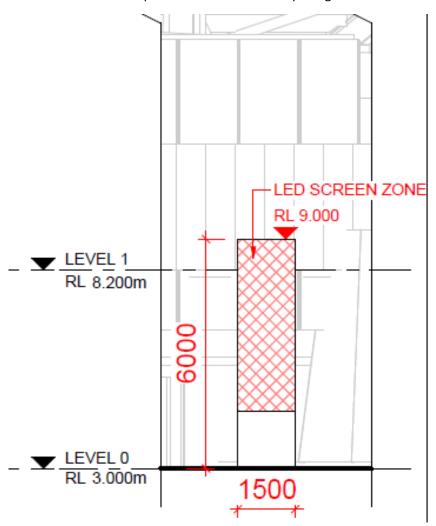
Extract from the Sign dimensions and elevation plan (source: Appendix A – Architectural Plans, Cox Architects)
